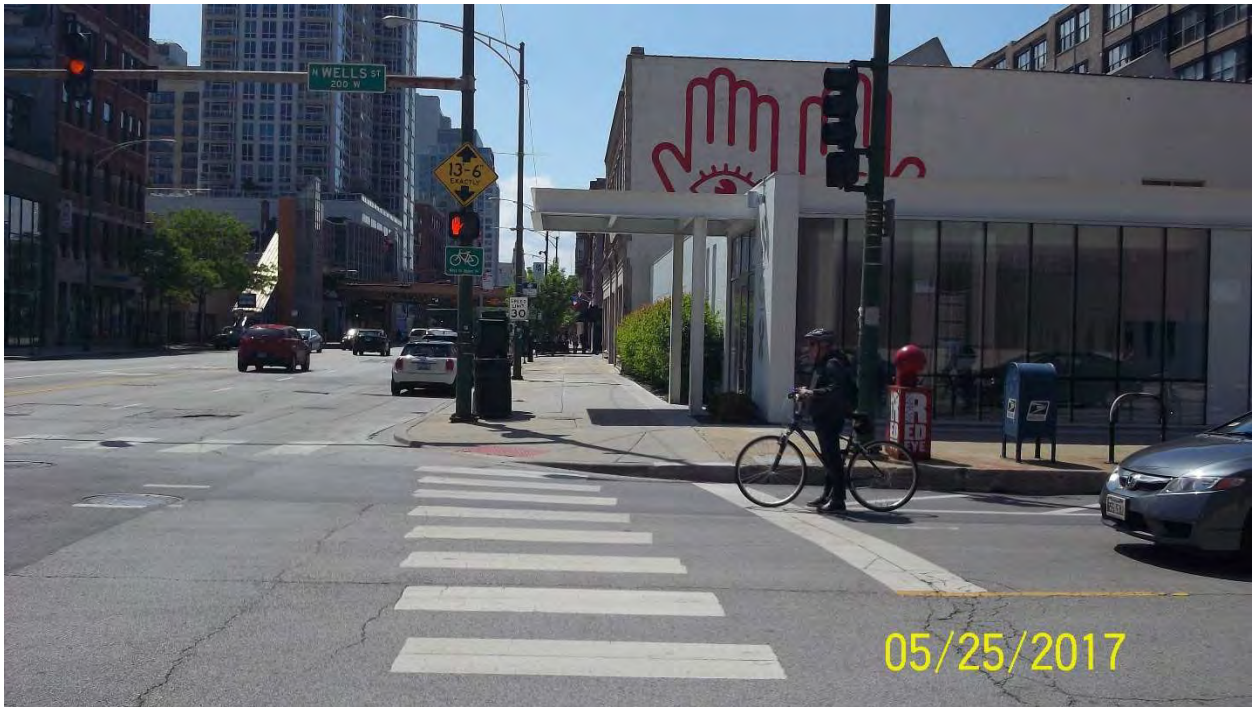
Northeast corner of Chicago Ave. / Wells St. – Looking West
